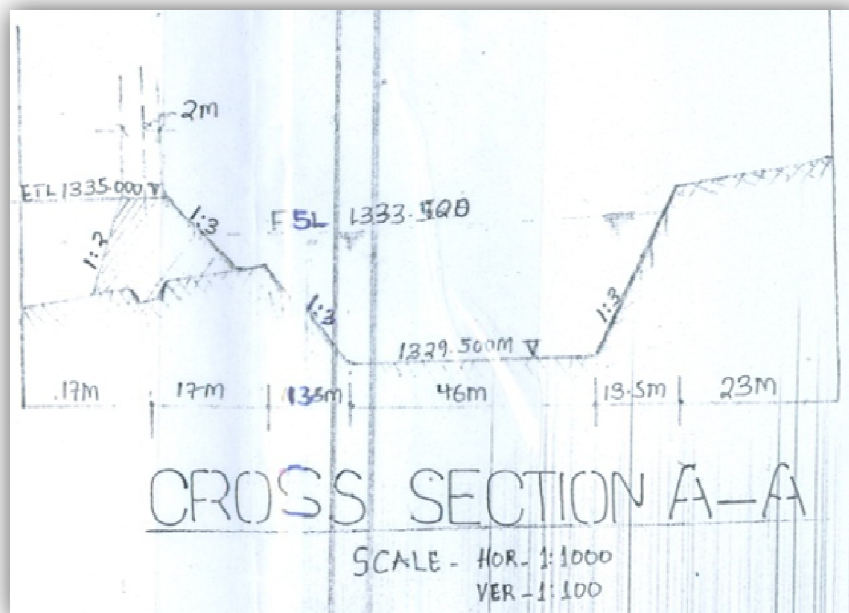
Cross section A-A of the Charco Dam embankment as taken from the layout plan
